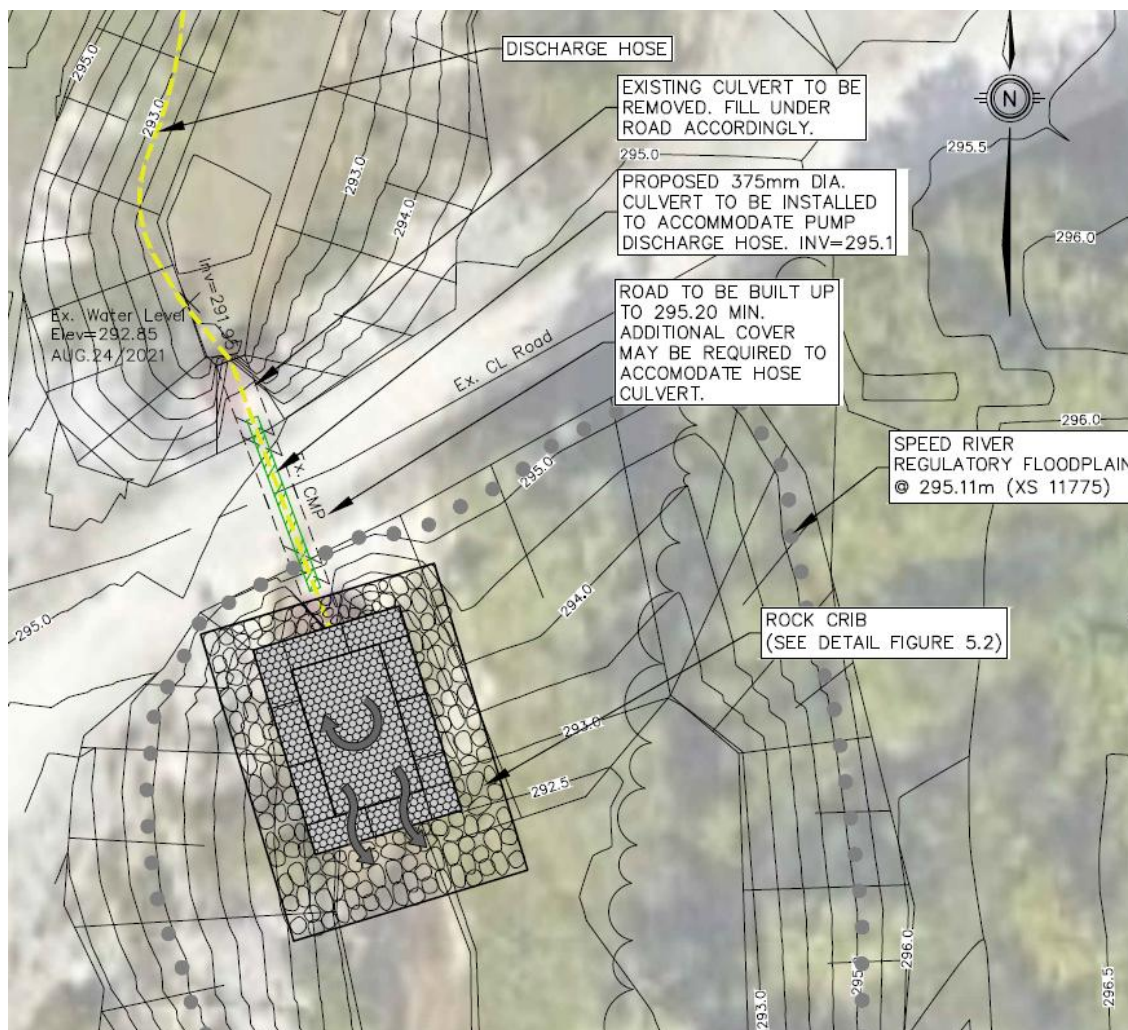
Quarry outlet rock crib plan (MTE, 2024b – Figure 5.1).
